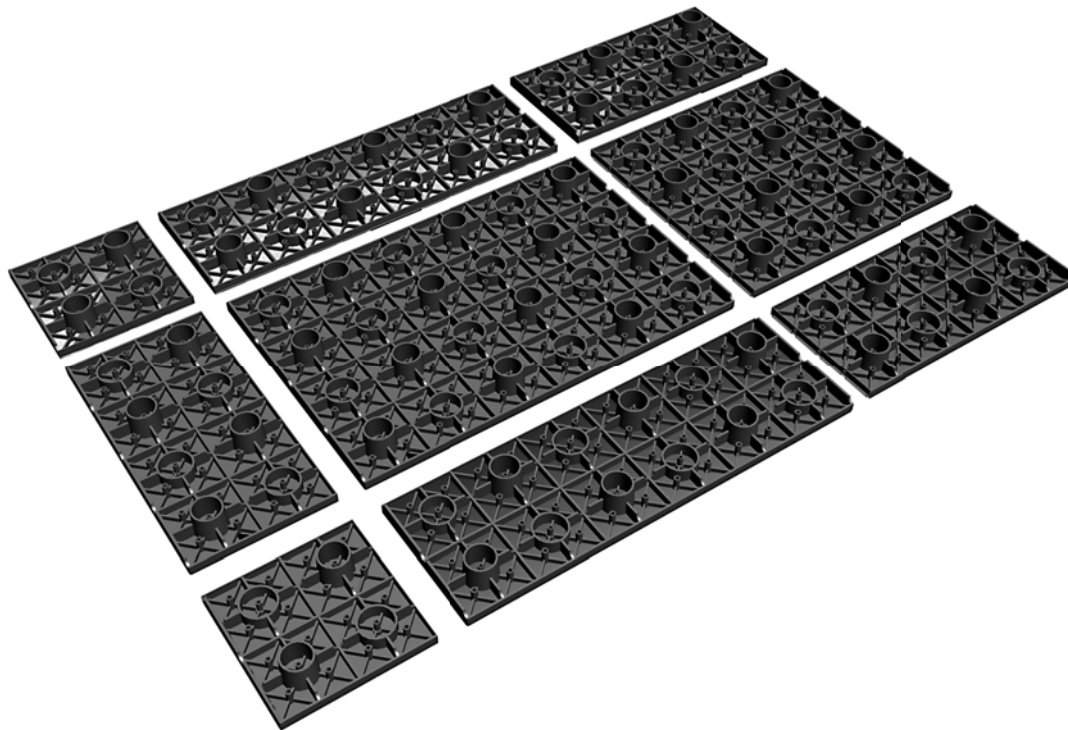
Exploded view of how the bottom panels are laid out to interlock properly with the top. This example would be for a 96" x 64" panel deck with a single whole panel in the centre. By expanding on this basic layout the deck can be extended in size in each direction as far as is required.
